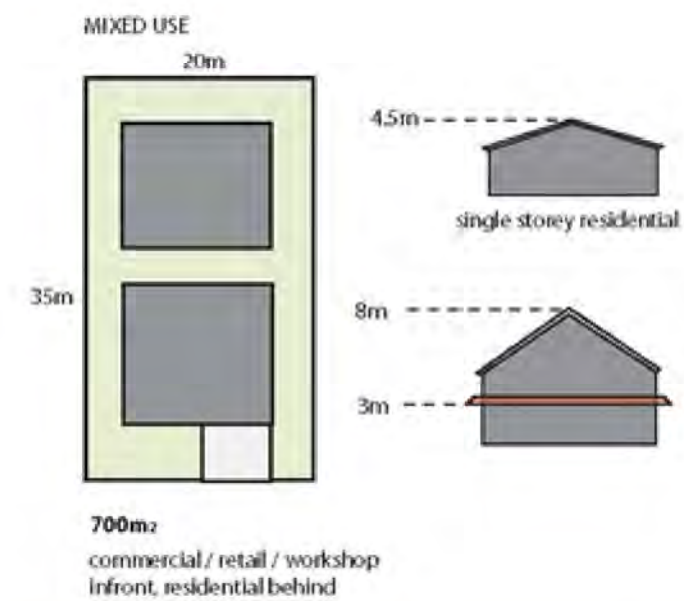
Mixed use development with retail behind (low density – 600m² - 800m²) identified as light industrial/residential transition area in Framework Plan 9: Future Land Use
